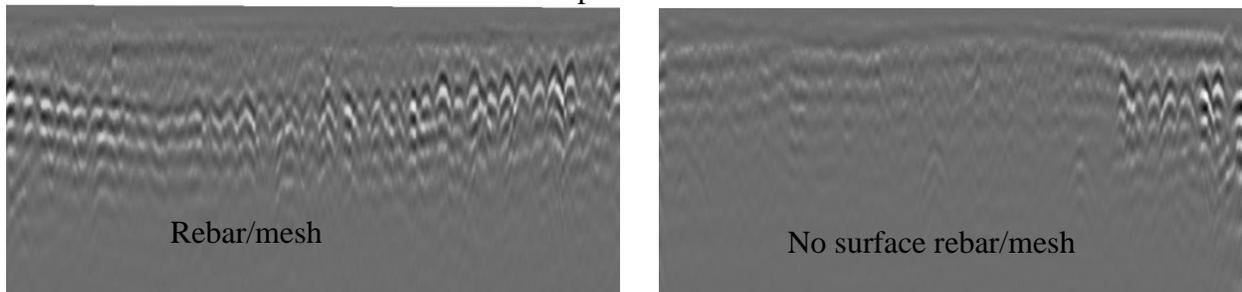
GPR profile showing the transition from structural slab to wire-mesh slab-on-grade.
